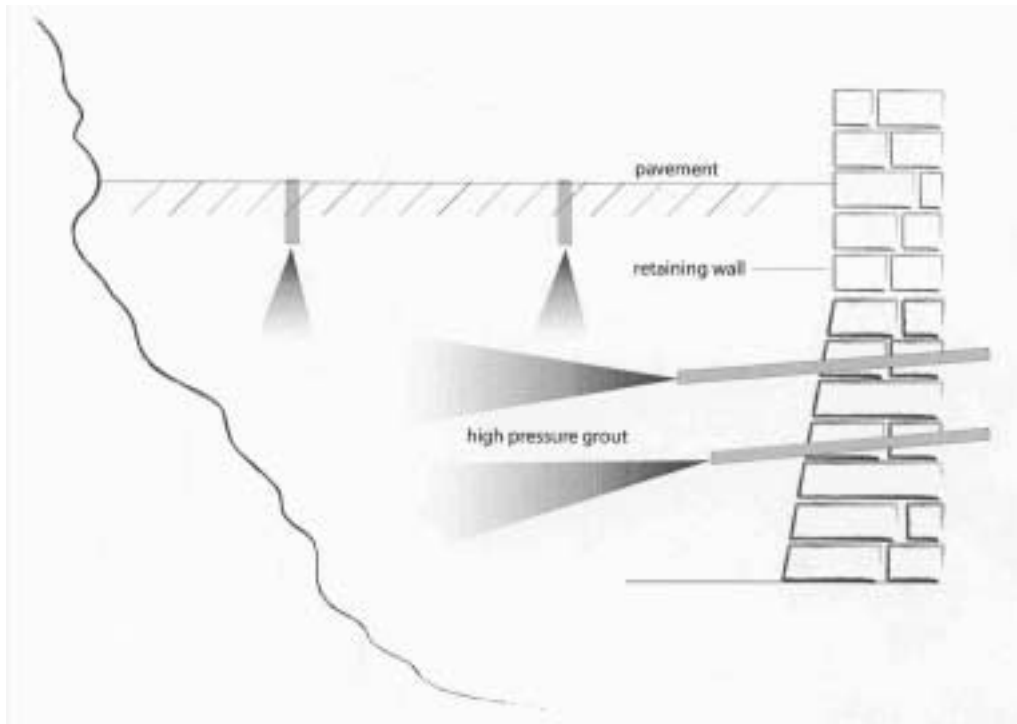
Repairing a retaining wall by injecting grout to stabilize the road base
